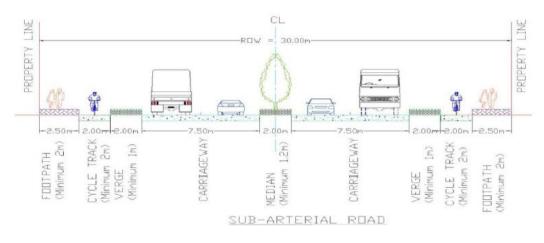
13 Typical section of sub- arterial roads (Nepal Urban Road Standard, 2076)
